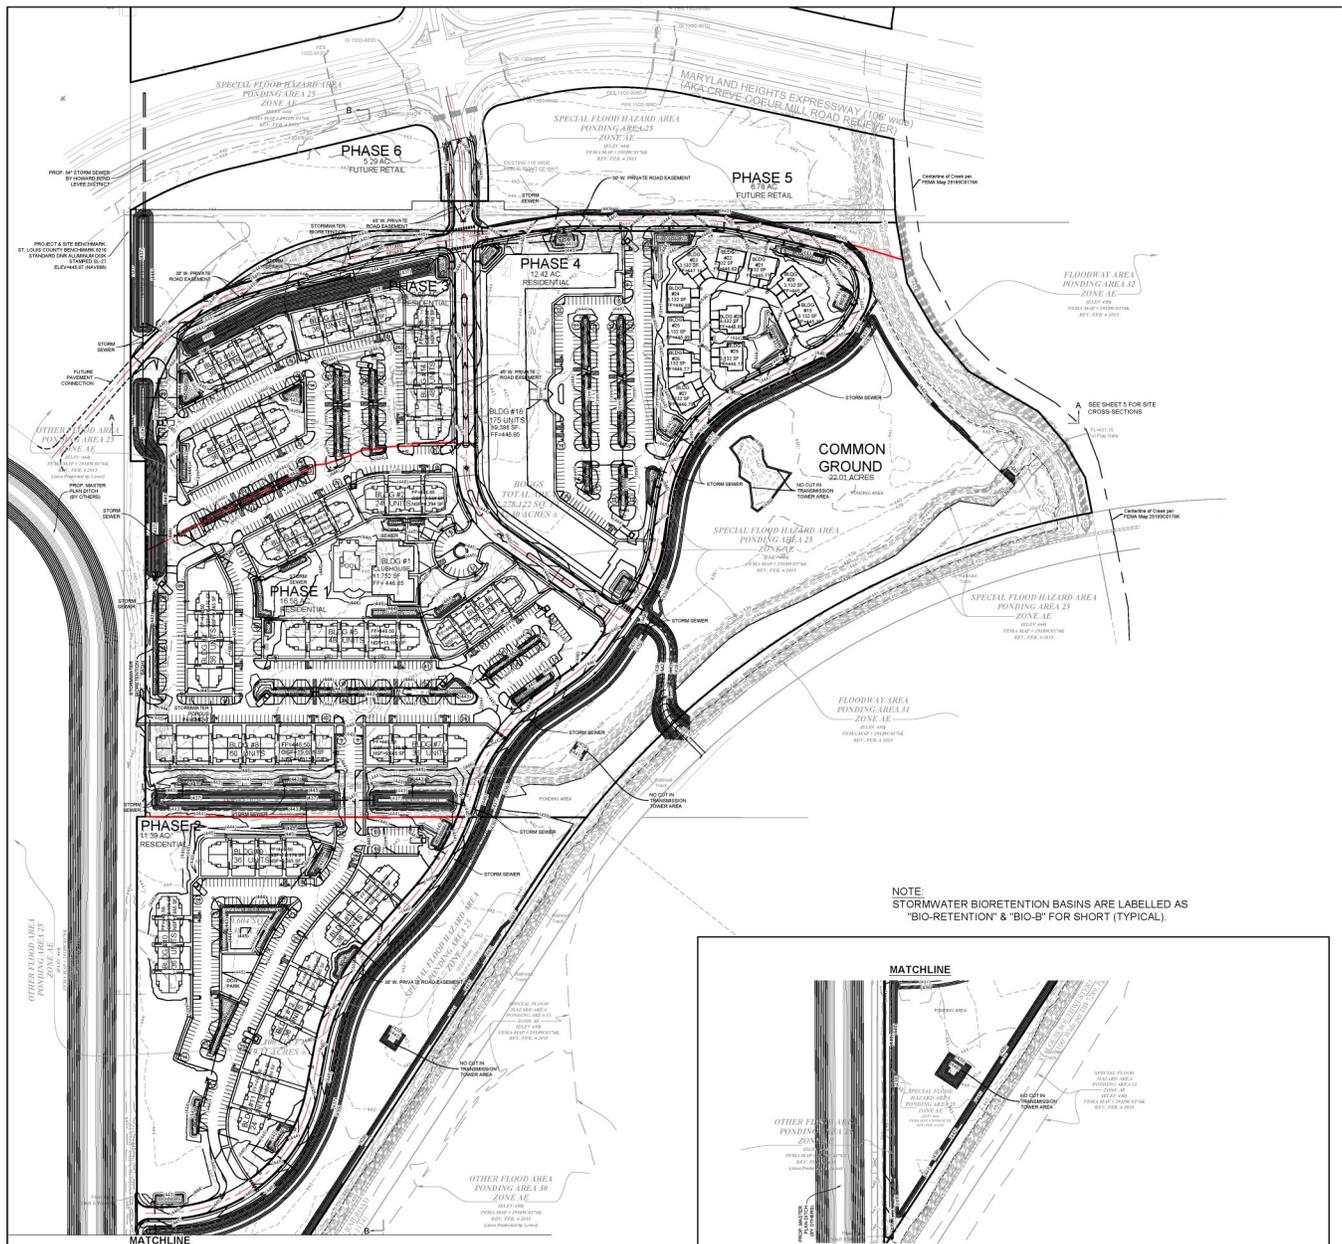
EXHIBIT C - PRELIMINARY DEVELOPMENT PLAN (CIVIL)
